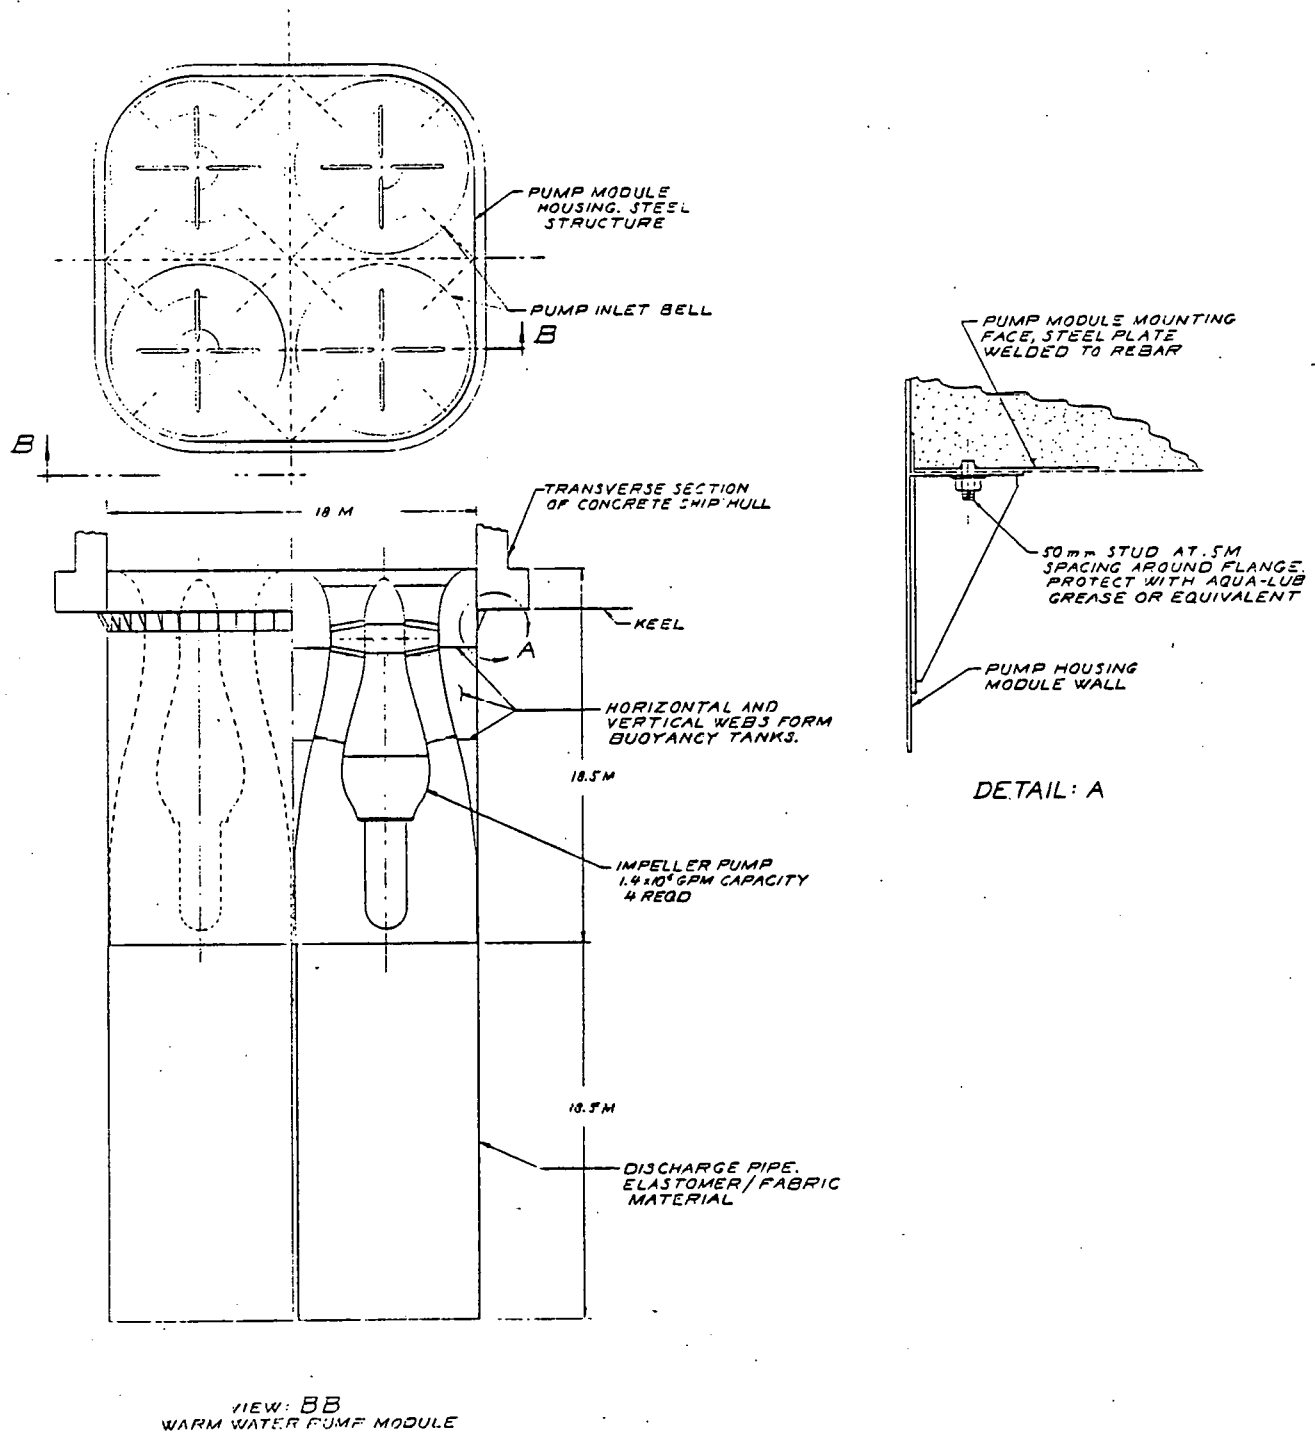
• Warm Water Pump Module Concept, OTEC 400-MW(e)
